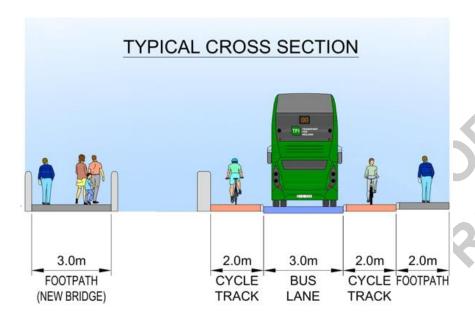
Section 2, Proposed Option 5 - Cross Section A-A
